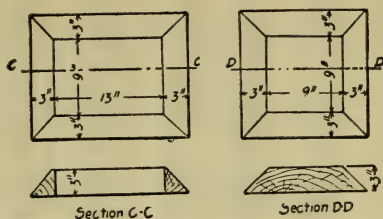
Forms for constructing openings for the entrance of ducts into concrete vaults.
